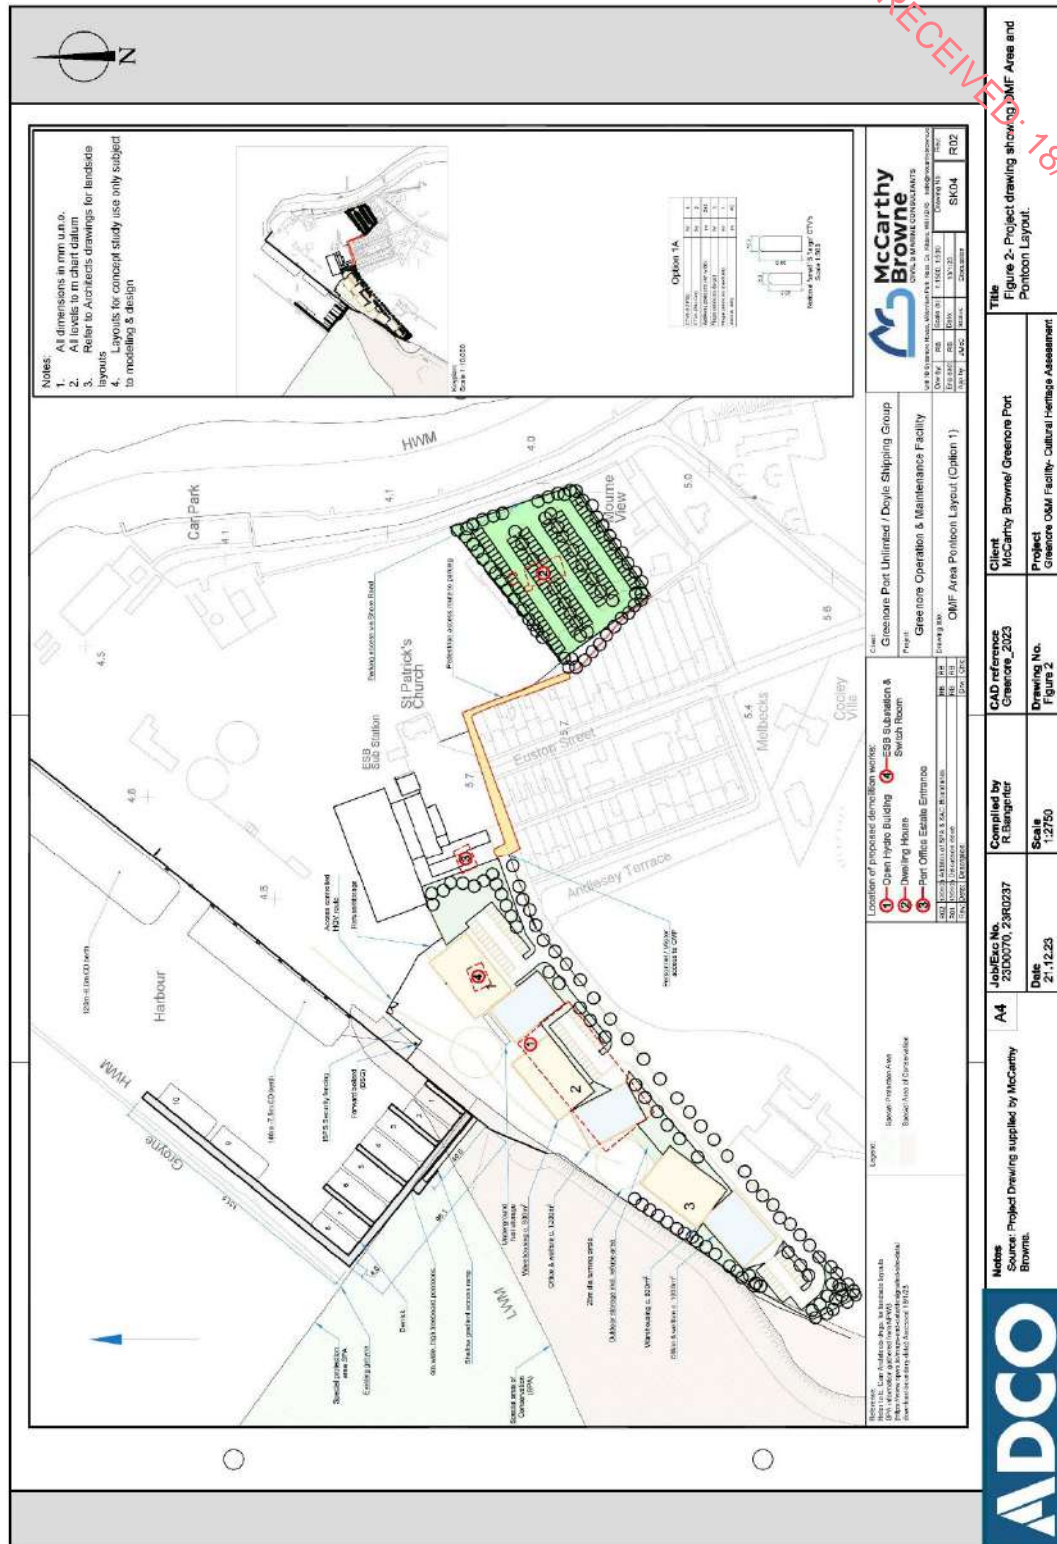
Project drawing showing OMF Area and Pontoon Layout
